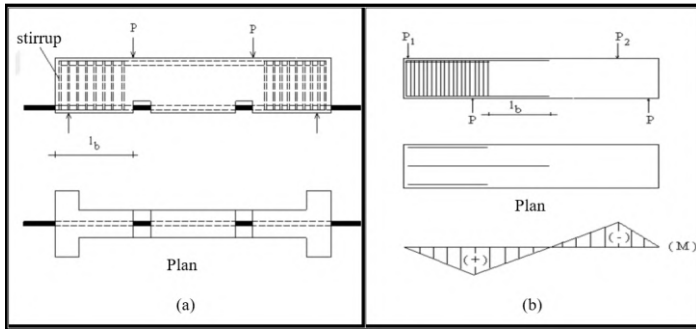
Beam test setups: a) Bureau of Standards test, b) Texas Beam test (Tuğrul Tunç, 2020).
